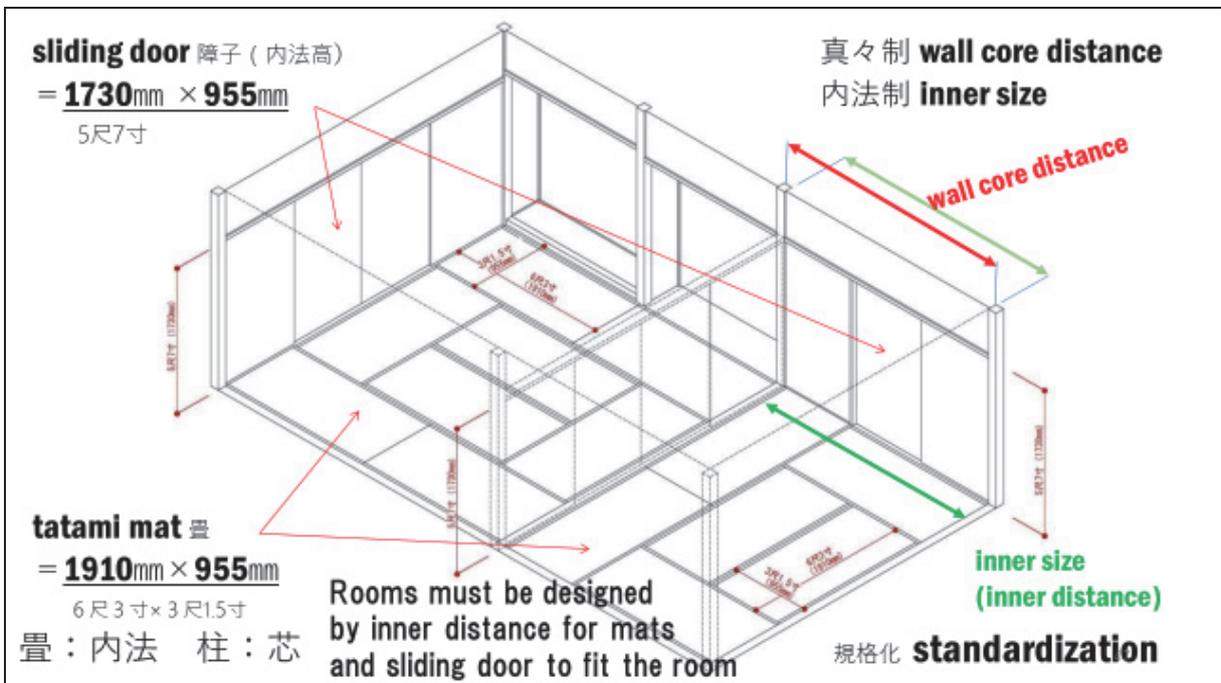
Standardized inner distance and wall core distance of room in Kyoto townhouse.
